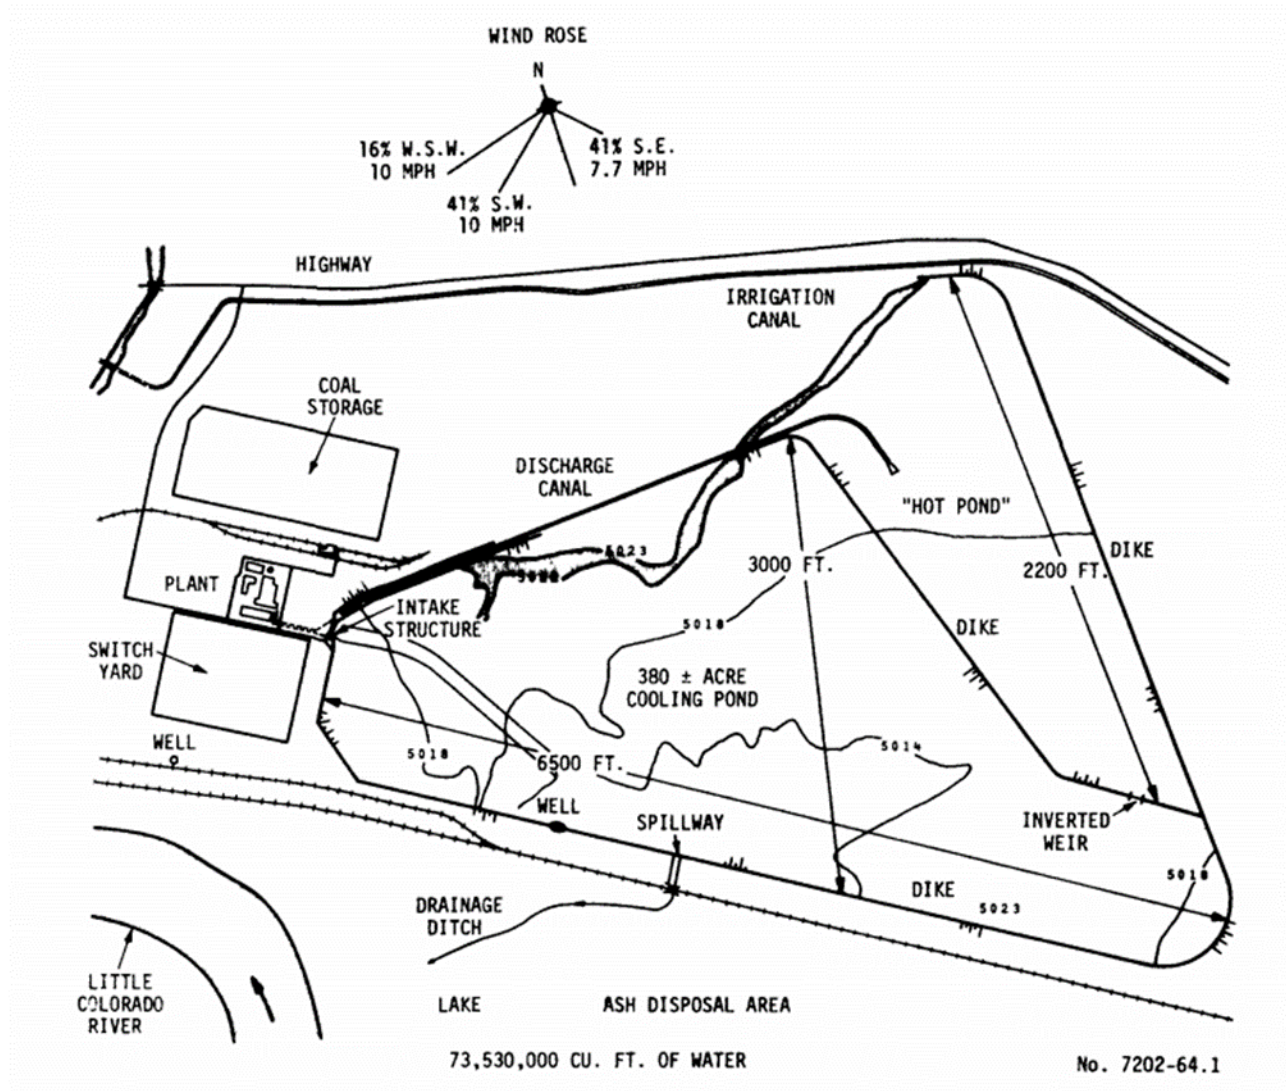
Cooling Pond Example—Cholla Steam Plant, Holbrook AZ (Hanford Engineering Development Laboratory, 1972).
